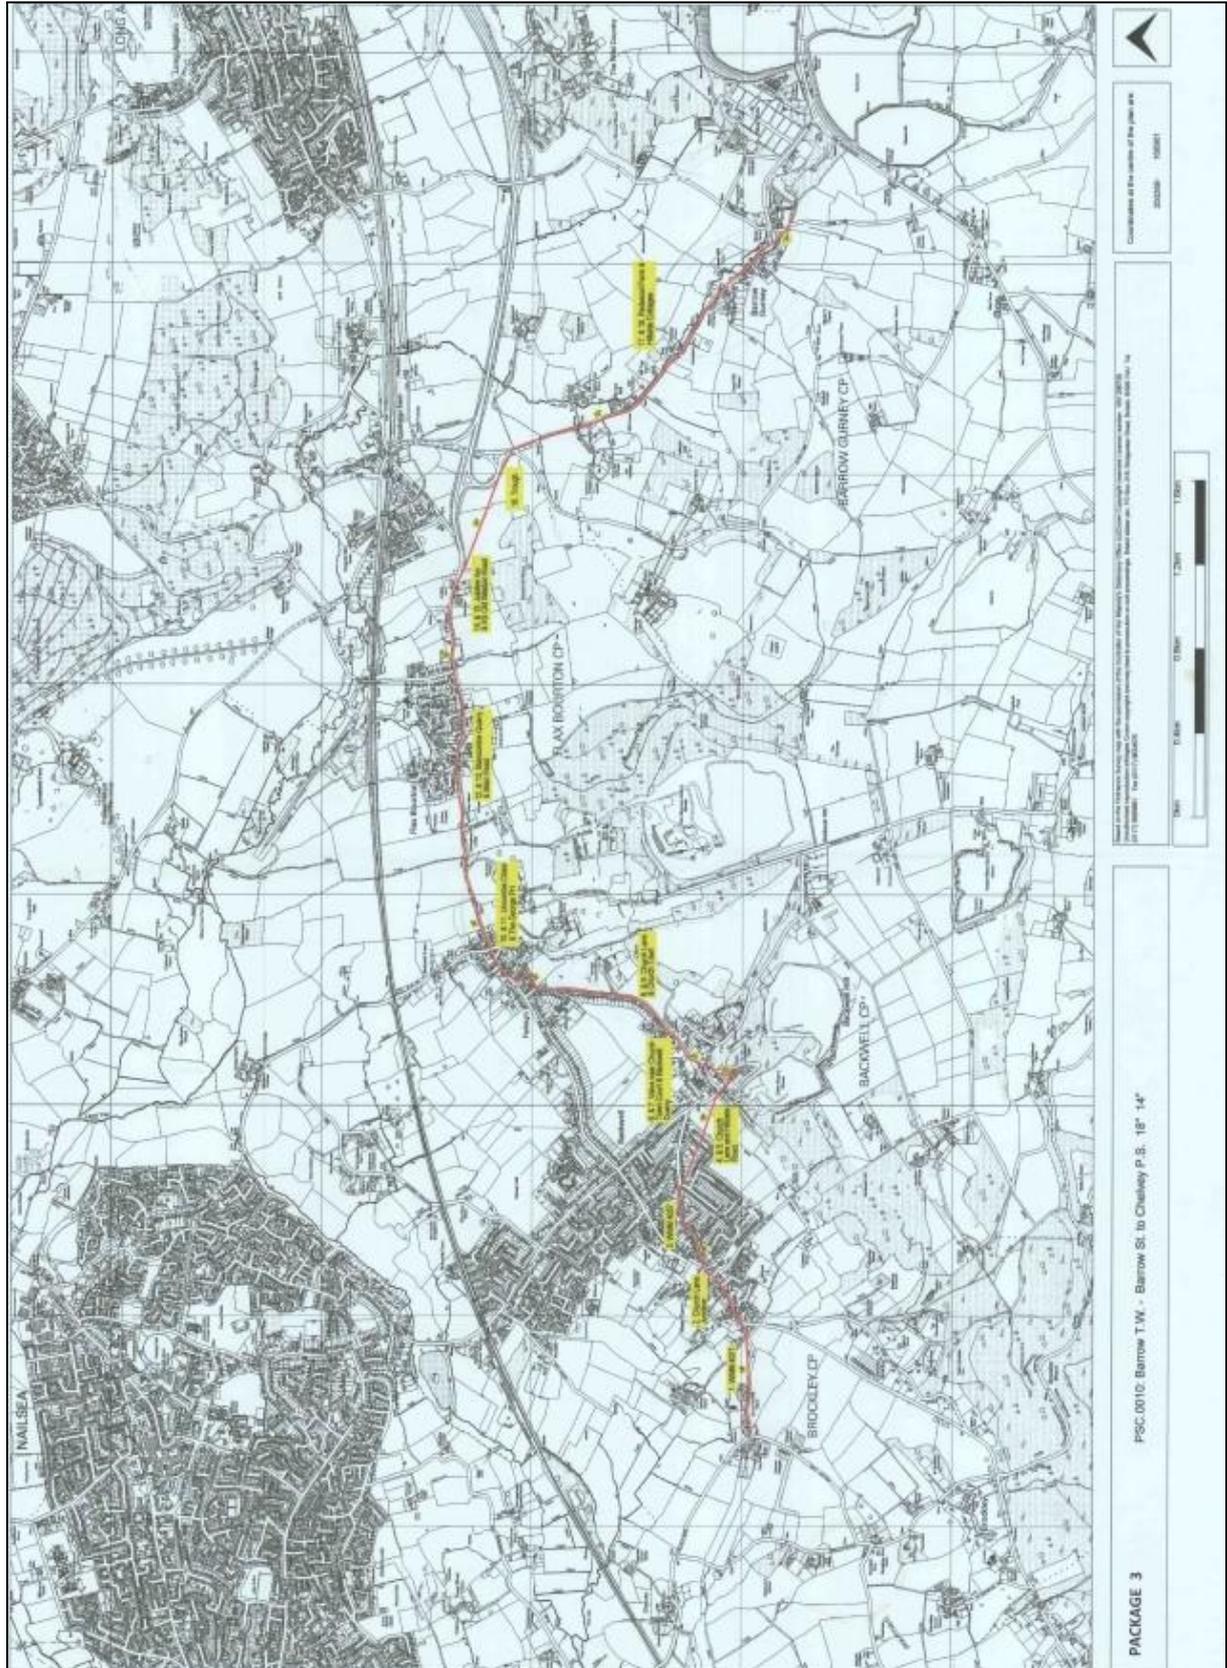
Plan showing the route of the proposed water mains pipeline scheme from Barrow Gurney to Chelvey pumping station (Package 3)
